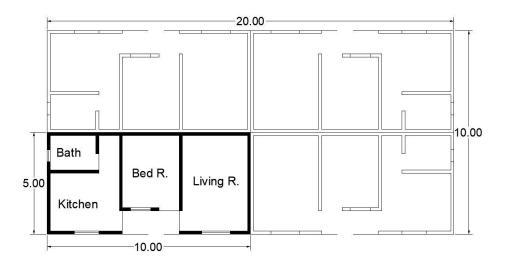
Domiz-one refugee core shelter, Base case floor plan (Case 1)
